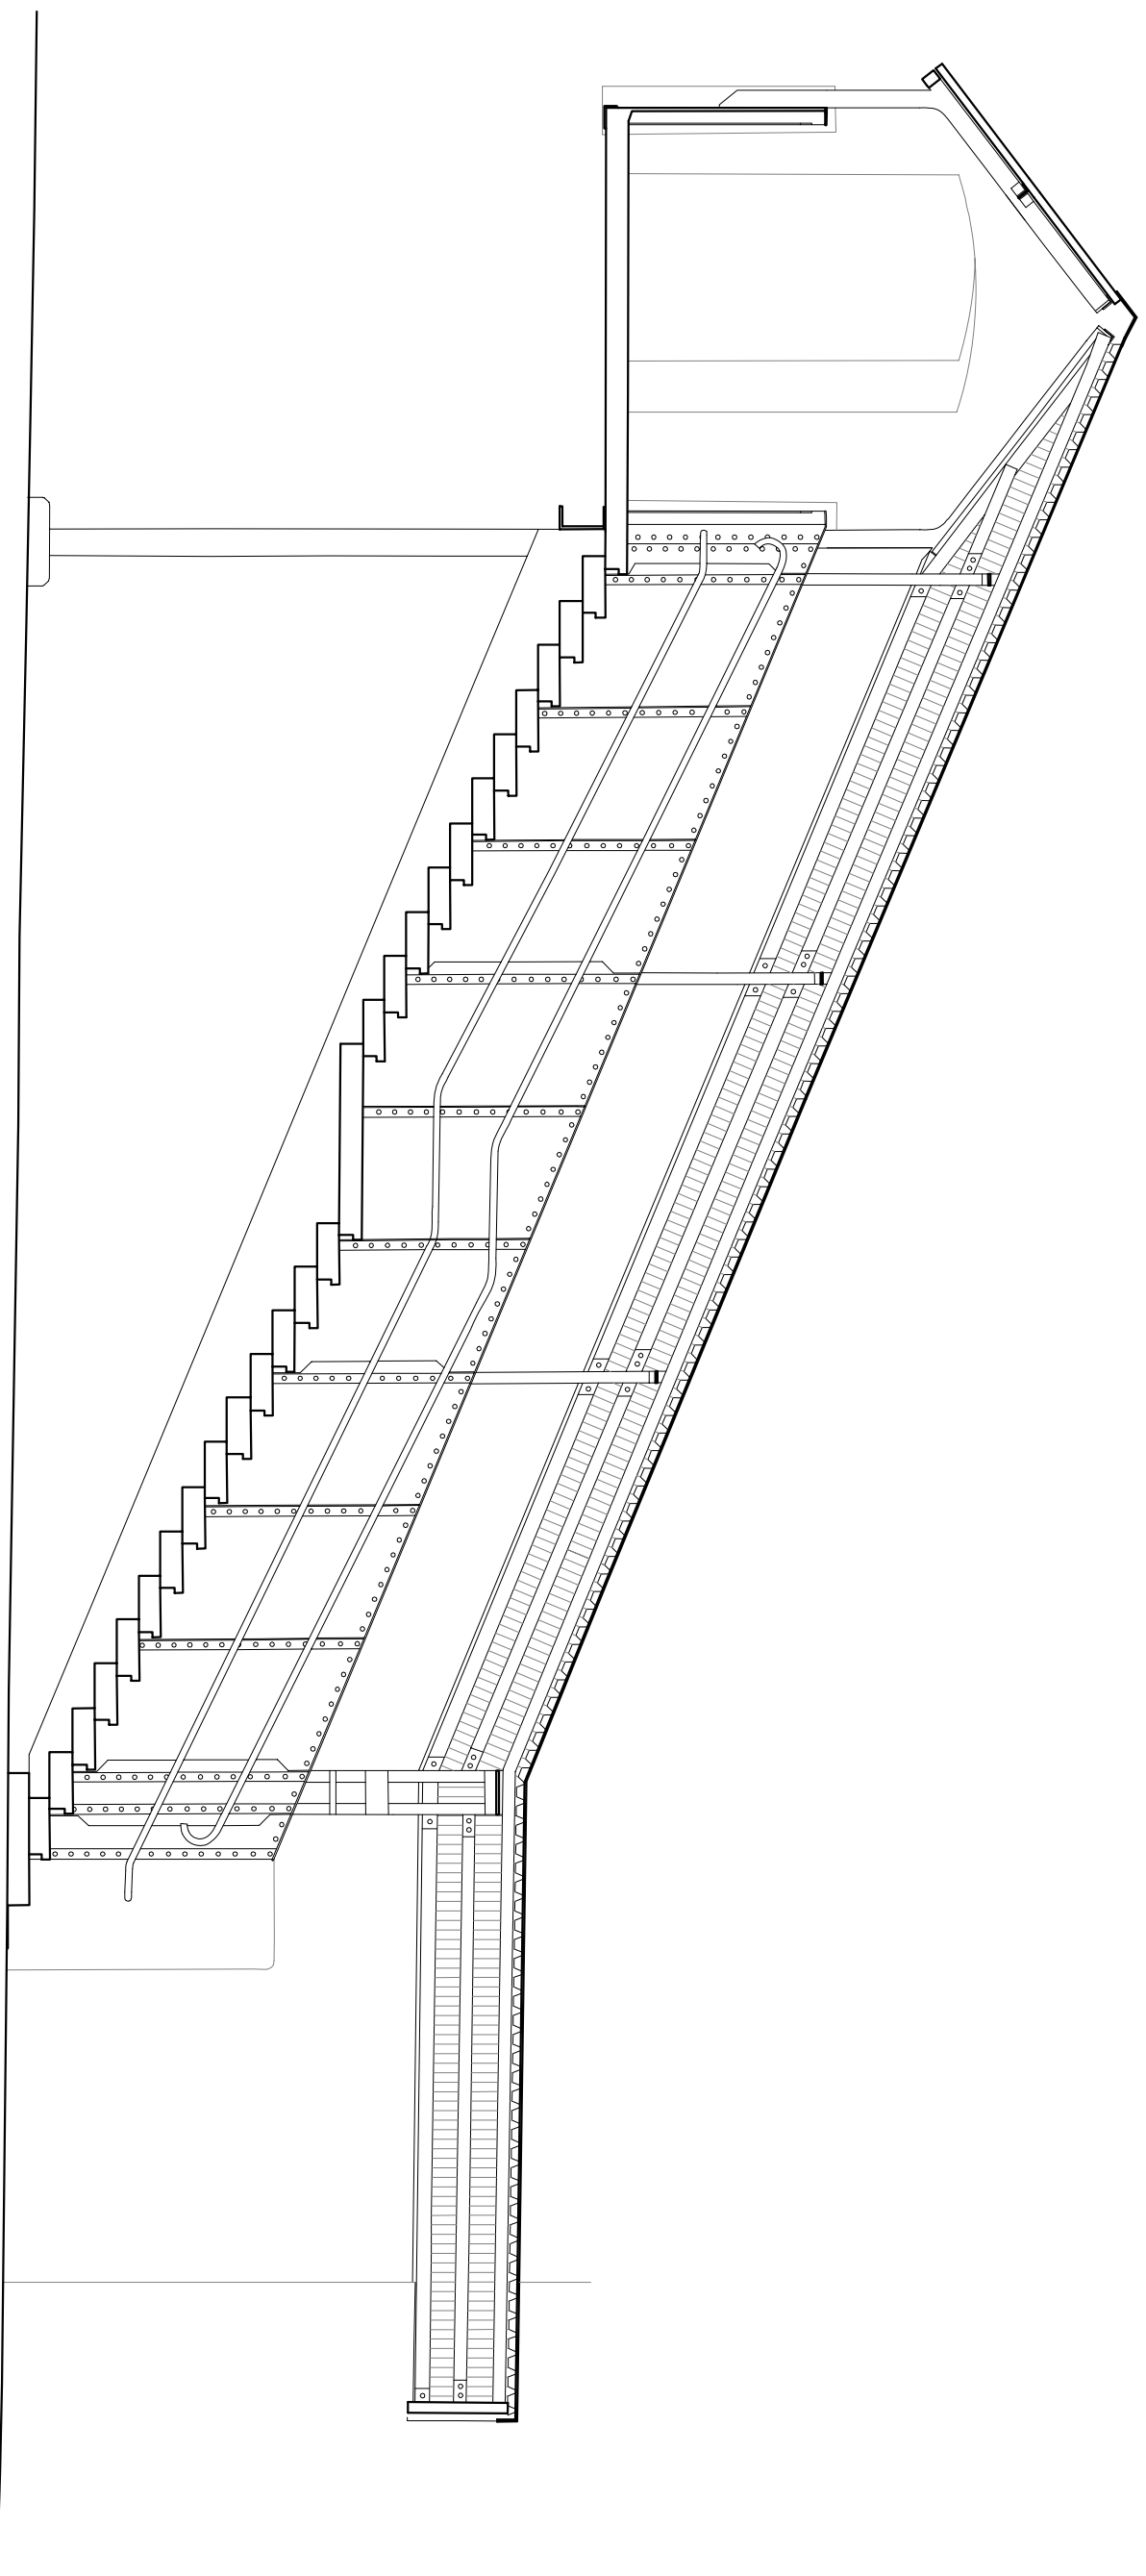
South-facing sectional elevation through the footbridge between platforms 1 and 2
